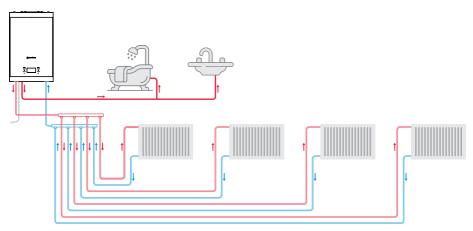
Scheme of use of the boiler in a mobile tubular distributed heating installation system
